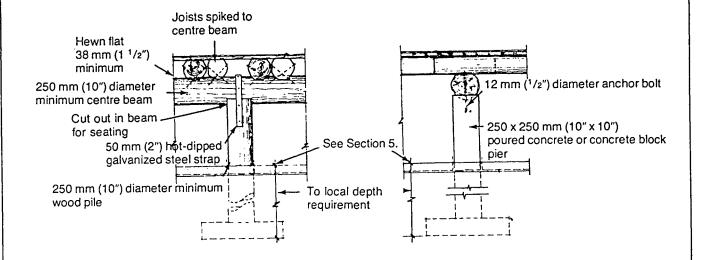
PART PLAN, (centre floor beam) TYPICAL CENTRE BEAM DETAILS
